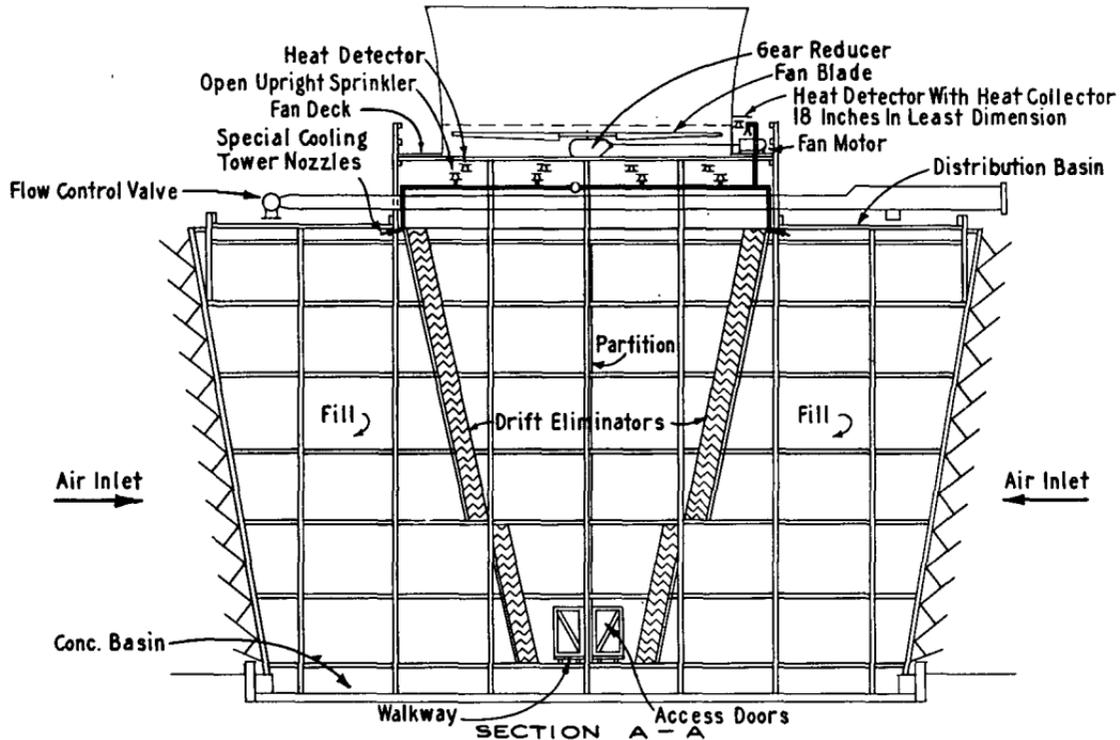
Typical deluge fire protection arrangement for crossflow towers.
